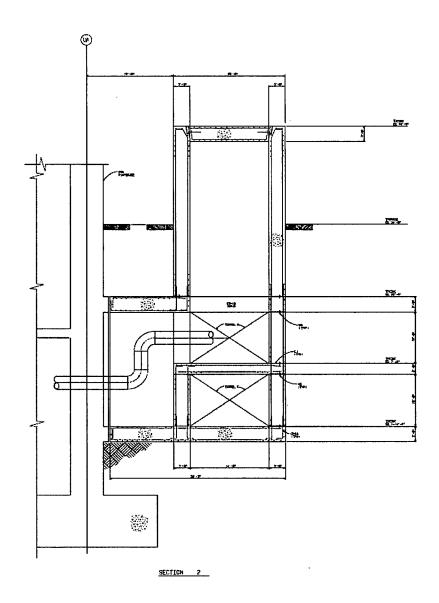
S1.270: RSW Piping Tunnel Section
